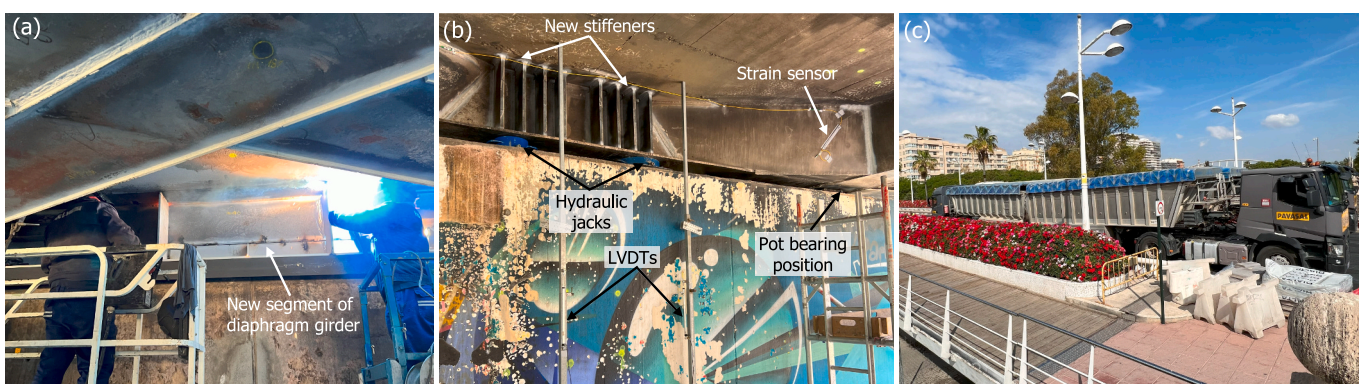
Repair works: (a) Replacement of damaged section of the diaphragm girder. (b) Raise of the deck to enable pot bearings replacement. (c) Load test.
